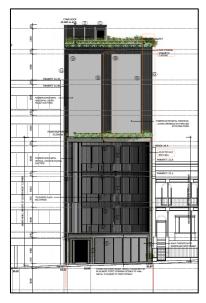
extract of the south elevation of the decision plans under planning permit TP-2018-204/B at 124-126 Jolimont Road (Source: Council)
